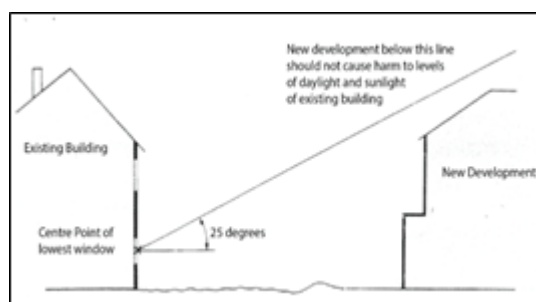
Section in plane perpendicular to the affected window wall from existing to proposed development showing acceptable application.
